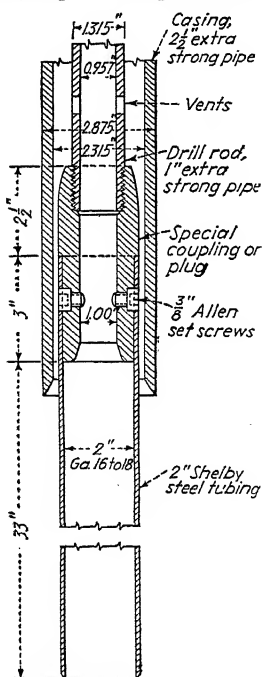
Shelby tubing sampler, by H. A. Mohr. (Jacoby and Davis "Foundations of Bridges and Buildings," 3d Ed.)
